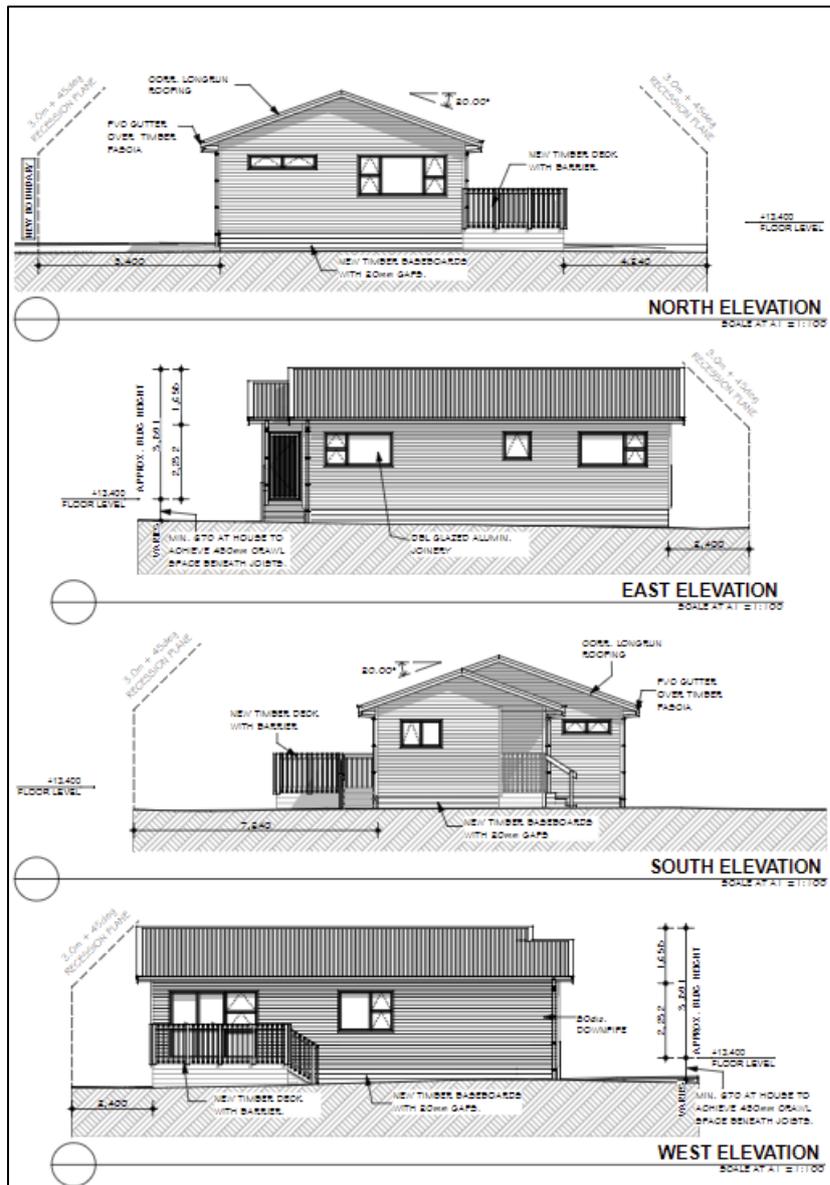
Proposed Elevation Plans (2-bedroom dwelling)
